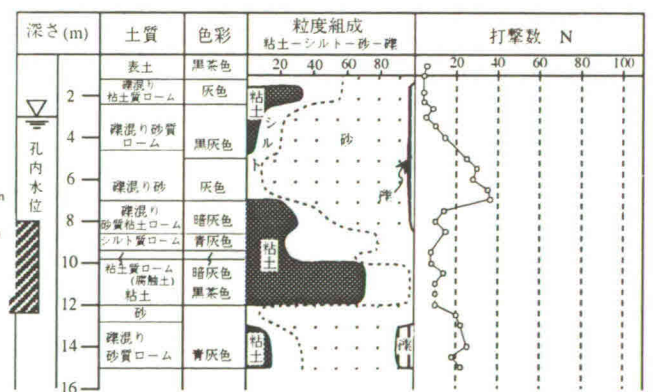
Typical soil profile along railway track on west side of Daikai station
